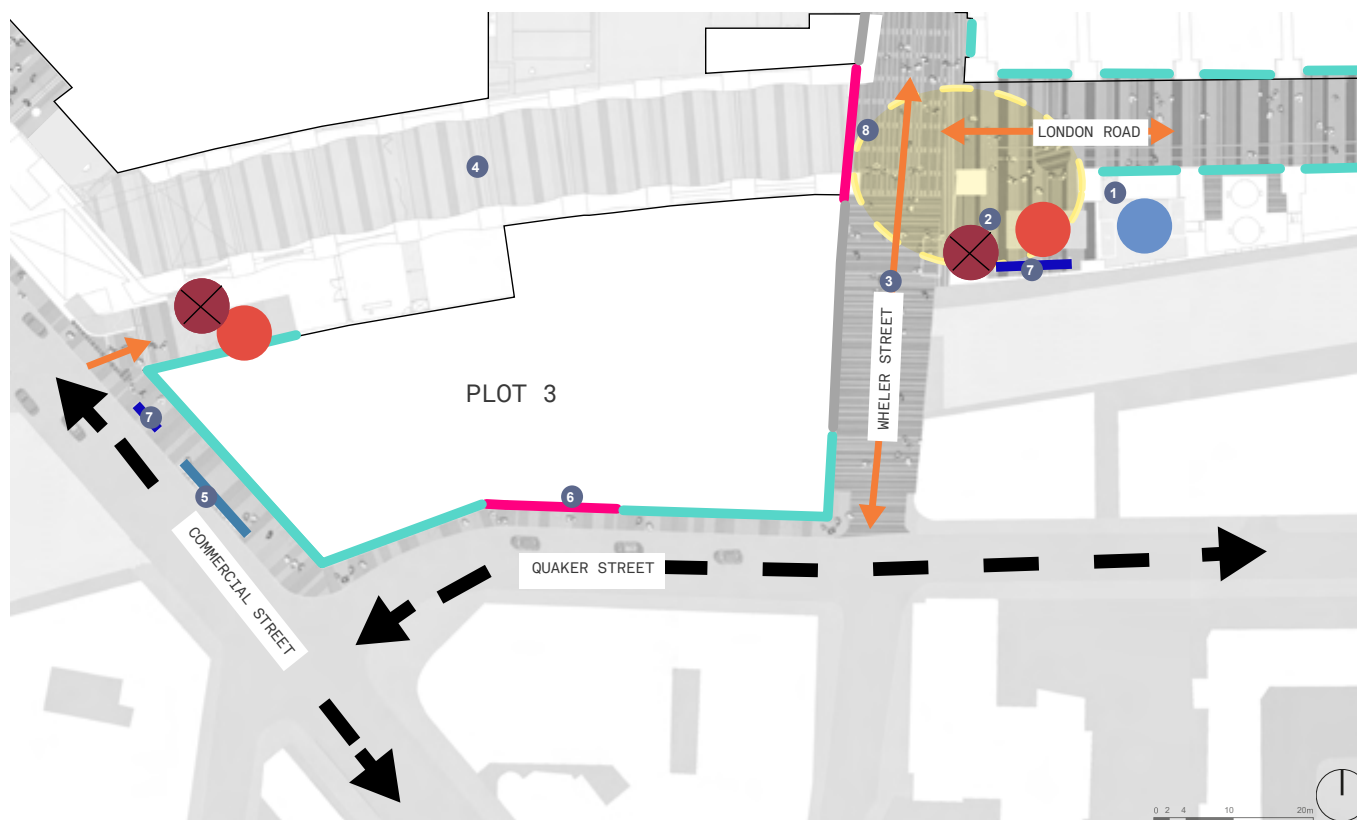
Plan: Quaker Street/Commercial Street
